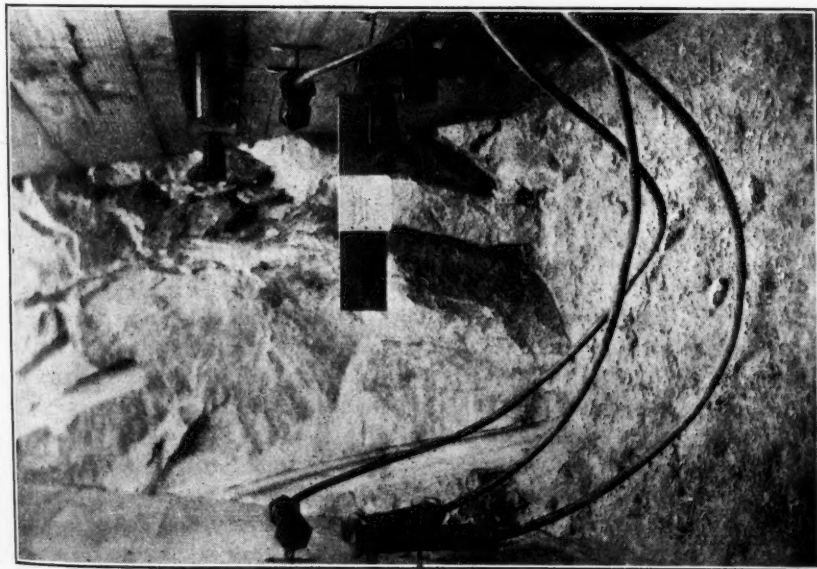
TELEMETERS AT LEFT-HAND ABUTMENT, STEVENSON CREEK TEST DAM.
